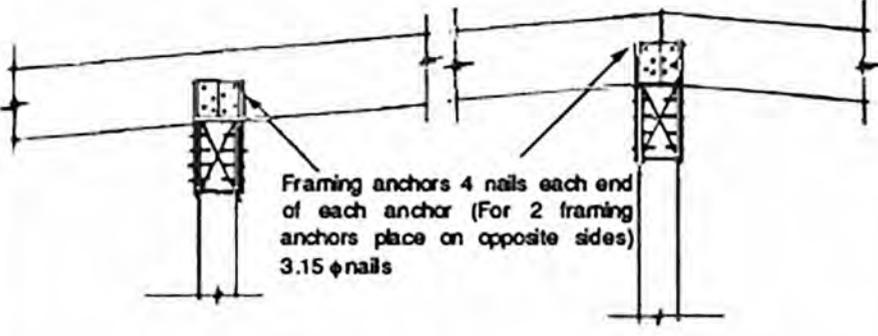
(C) TIE-DOWN: RAFTERS OR TRUSSES TO ROOF BEAMS, LINTELS, VERANDAH BEAMS AND INTERNAL WALLS		Design Strength (kN)
